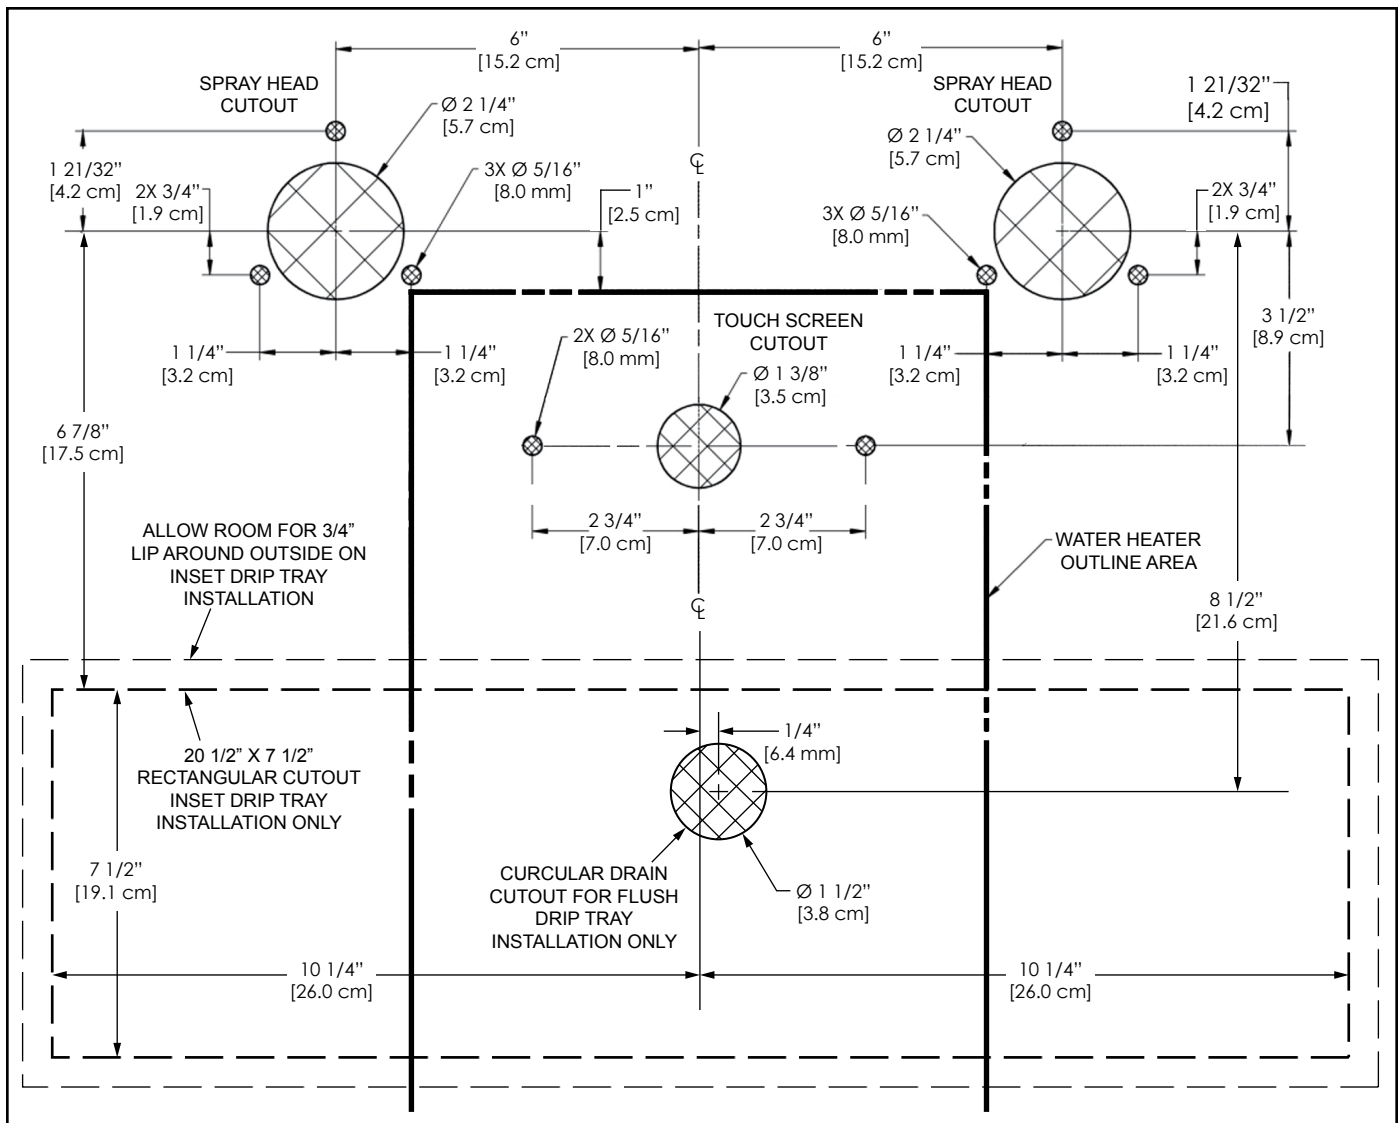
Hole Pattern Template for Cutting and Drilling Counter Top (Drawing Not to Scale)
